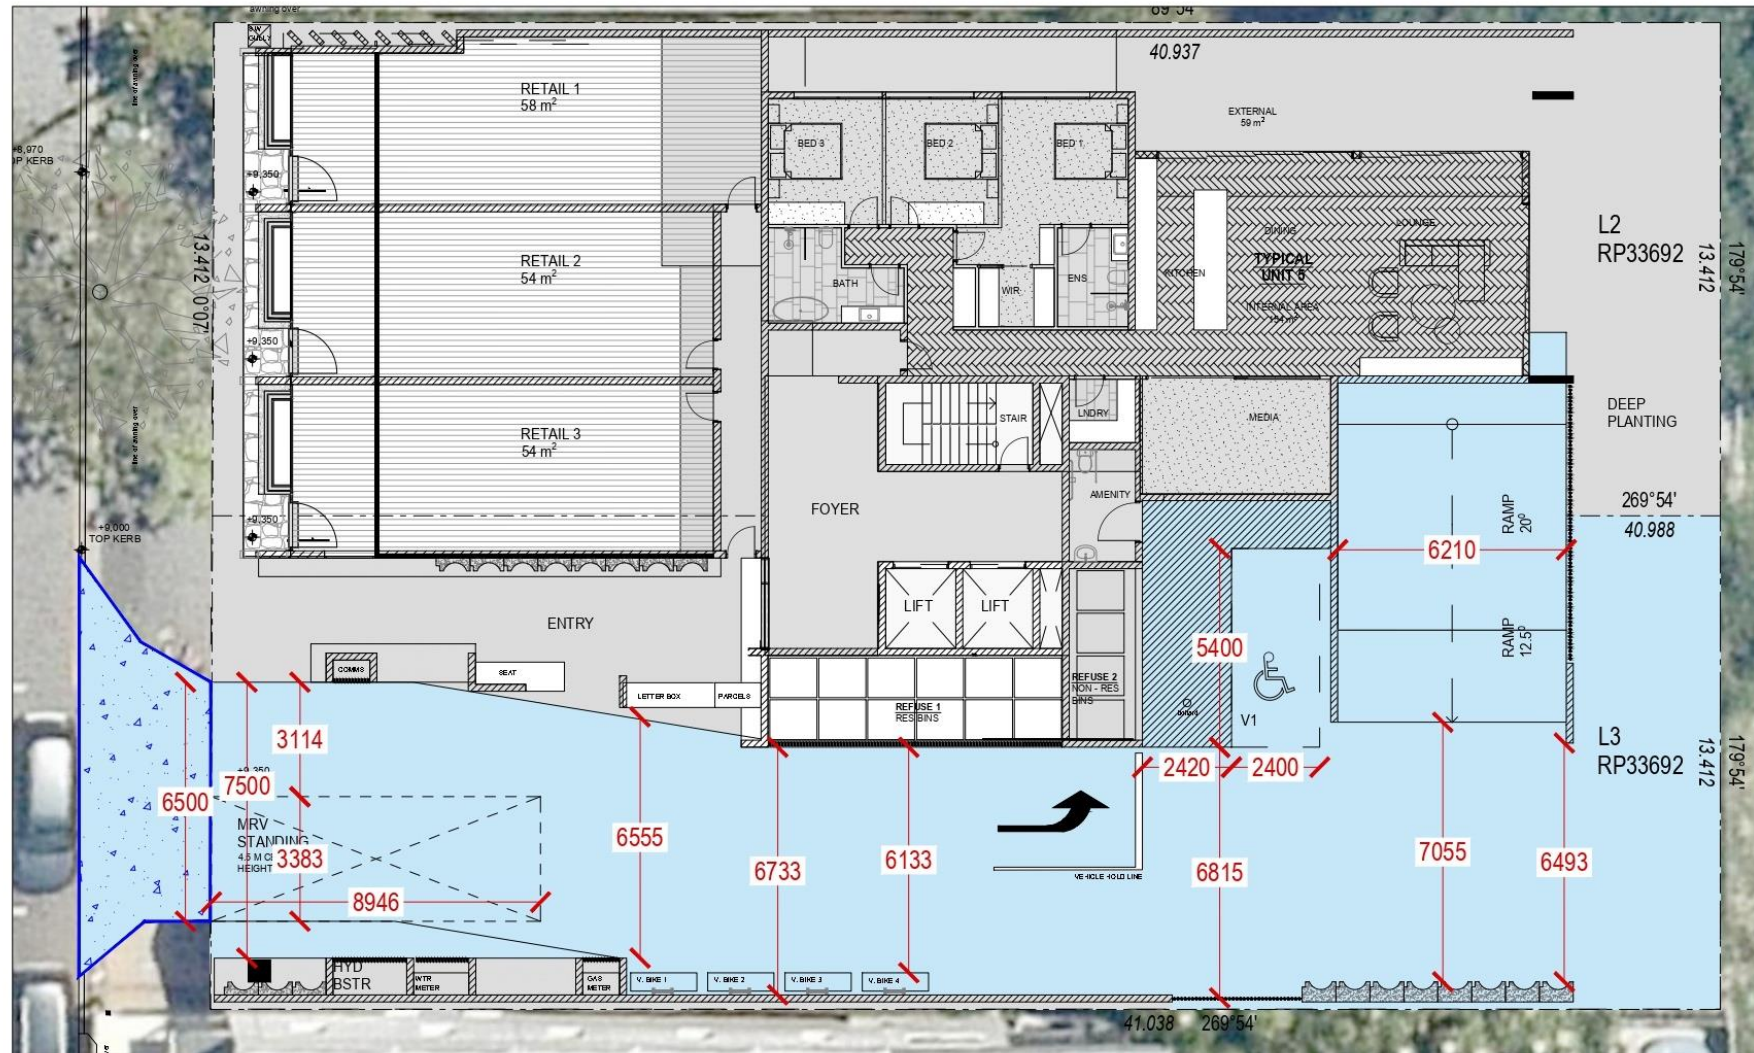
DIMENSIONED CAR PARKING LAYOUT (GROUND FLOOR)
